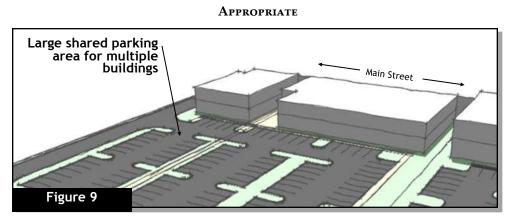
details a rear view of the shared parking complex as part of a larger development project with multiple buildings. The arrangement of the parking area and landscaping elements are covered in Sections D and E, respectively.
